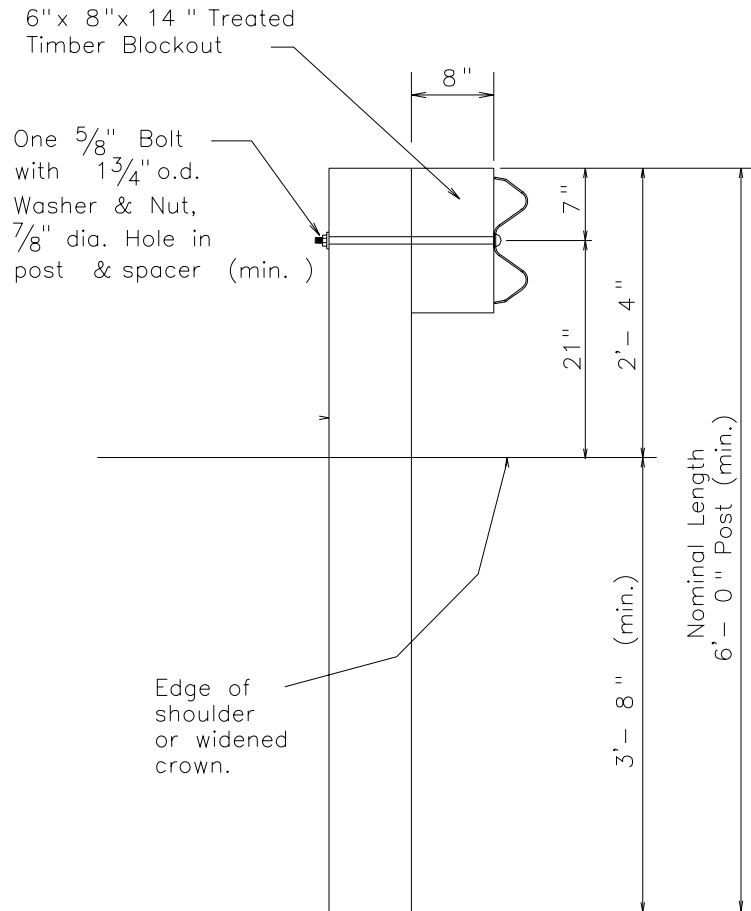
Typical Cross Section of Metal Beam Guard Fence.
